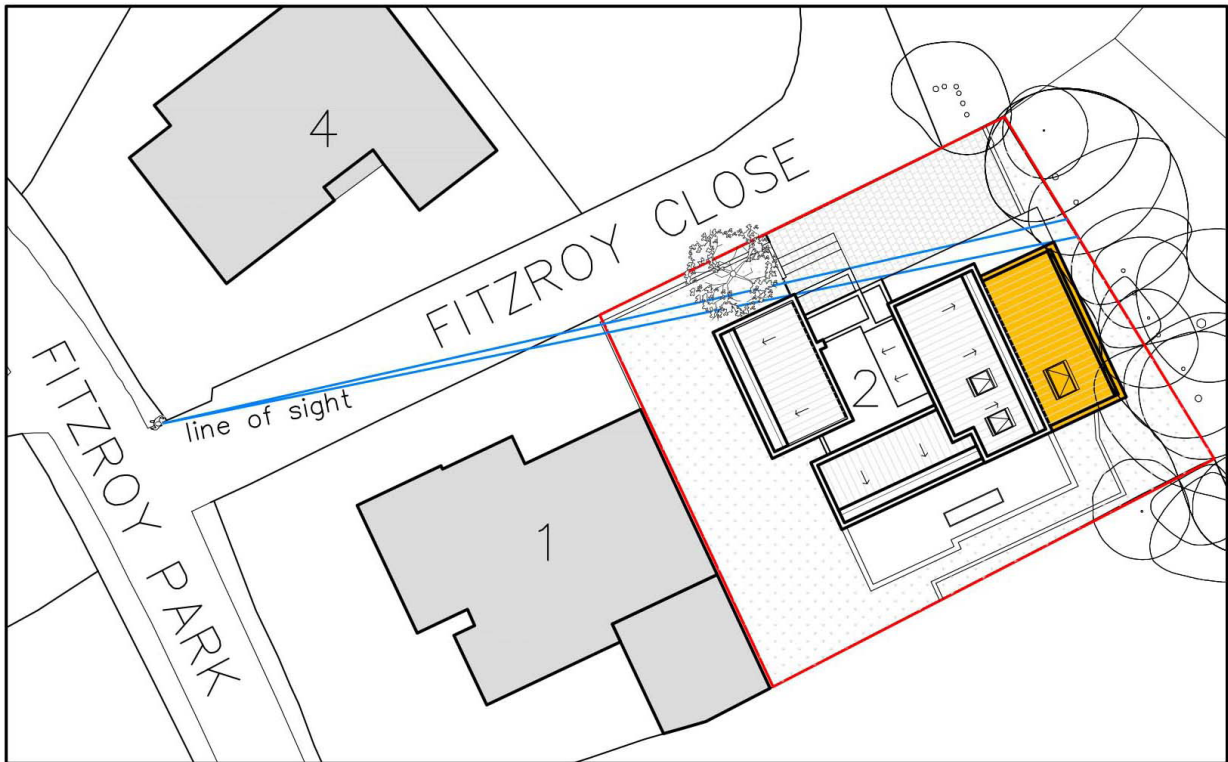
Extract of block plan illustrating lines of sight from Fitzroy Park (proposed side extension highlighted in orange).
